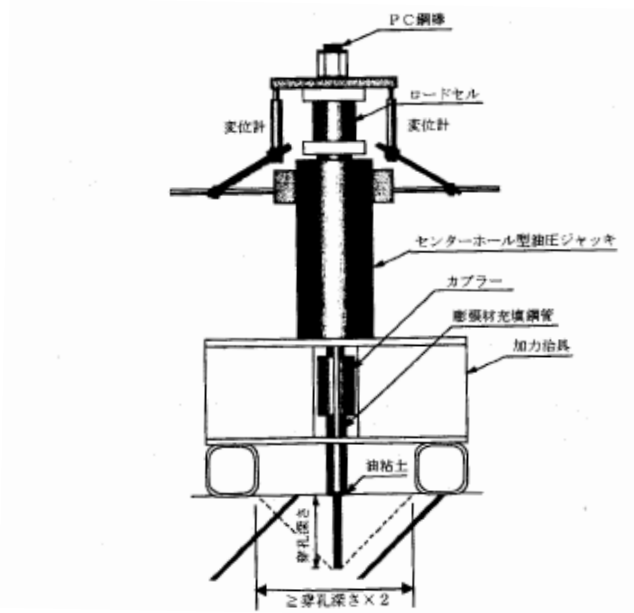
Pull-out test method for CFRP anchor (SR-CF 工法 研究会, 2001)
